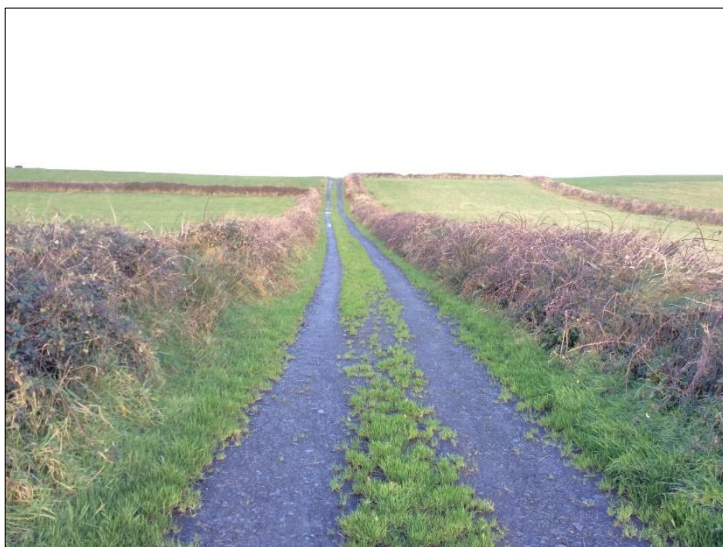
Proposed Onshore Grid Connection route along existing track to south of proposed Onshore Landfall Location (Killard Td.), looking NW.
